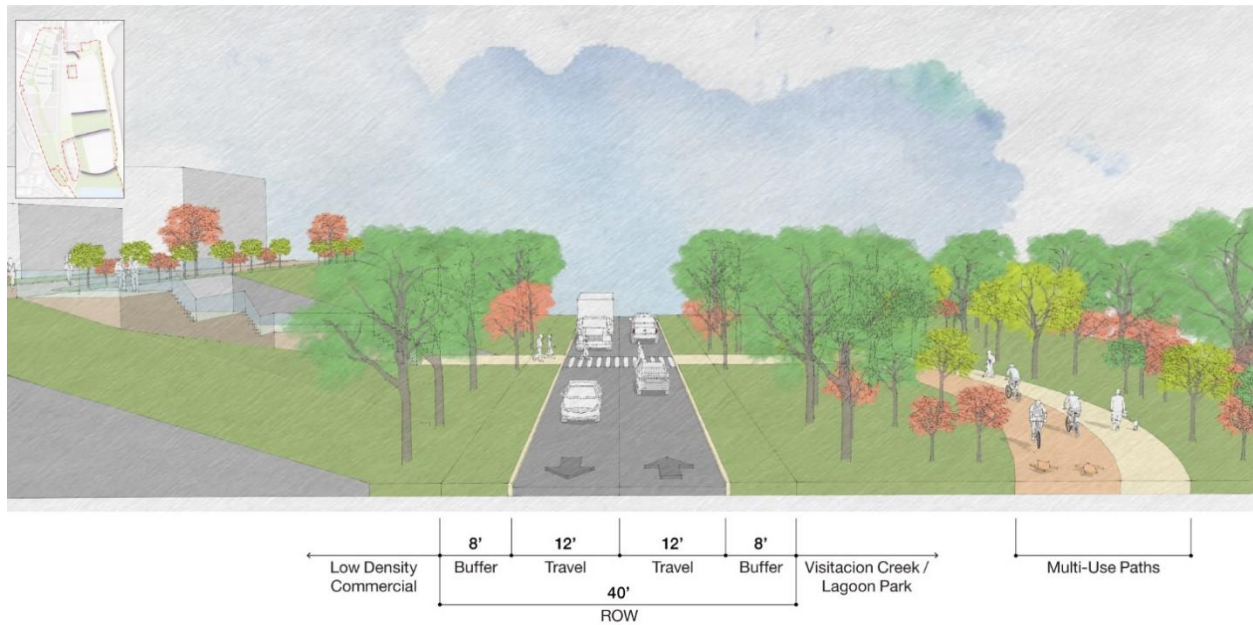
Sunnydale Avenue Proposed Cross-Section
